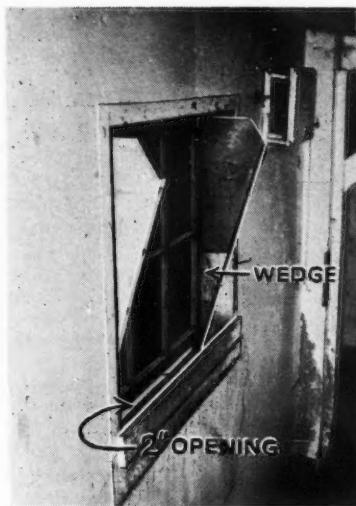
Tip-in window in LaValle poultry house showing 2-in opening at the bottom
